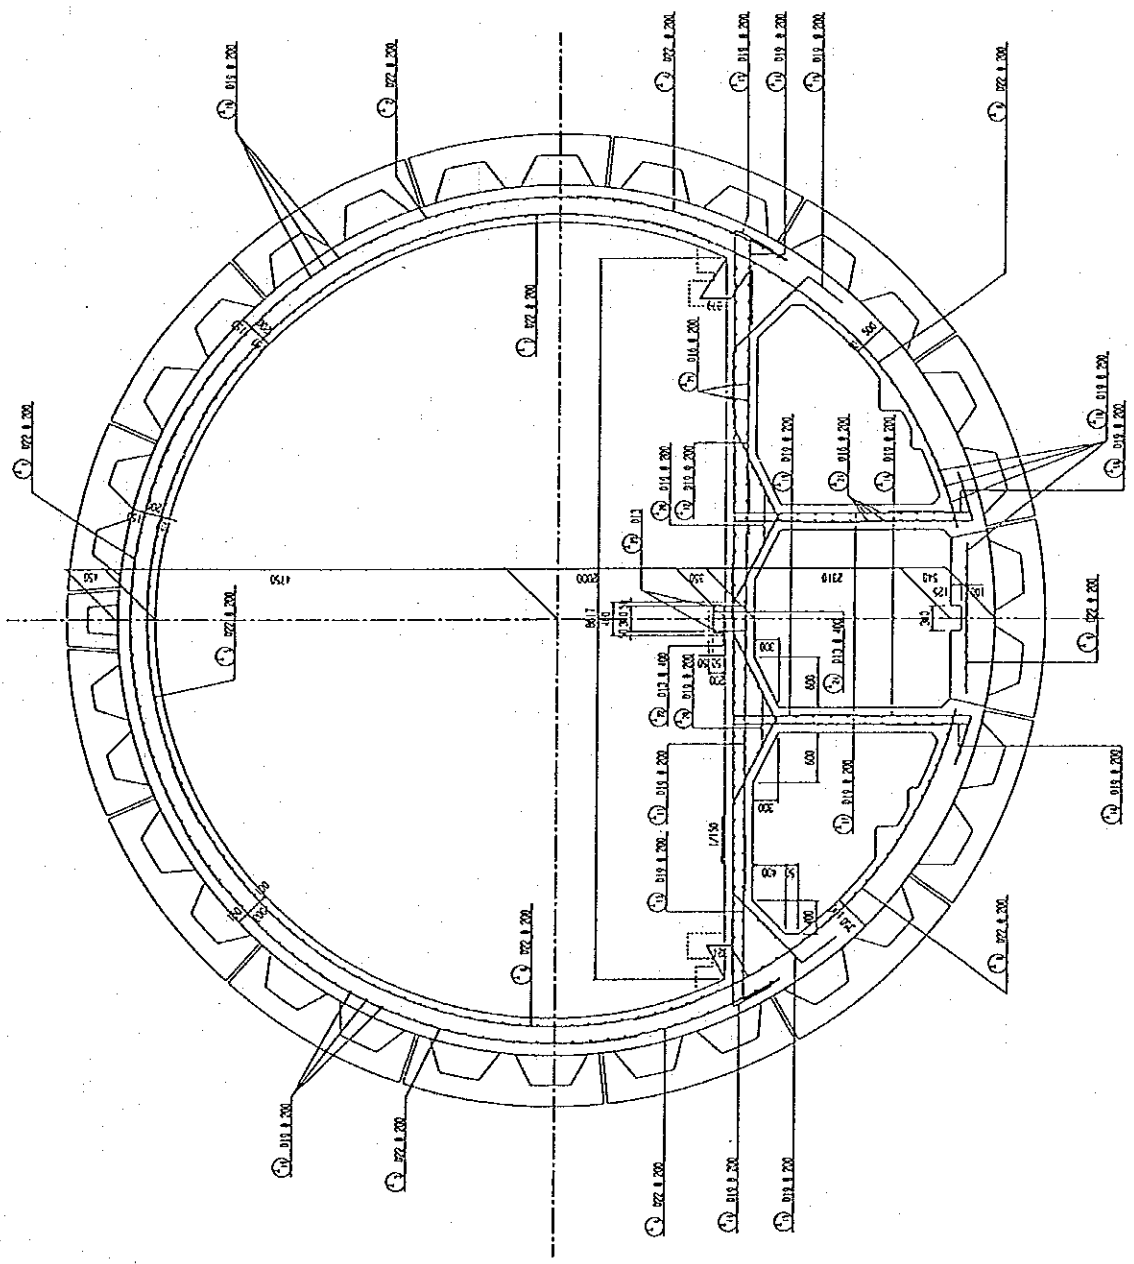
General Arrangement of Reinforcing Steel Bar
